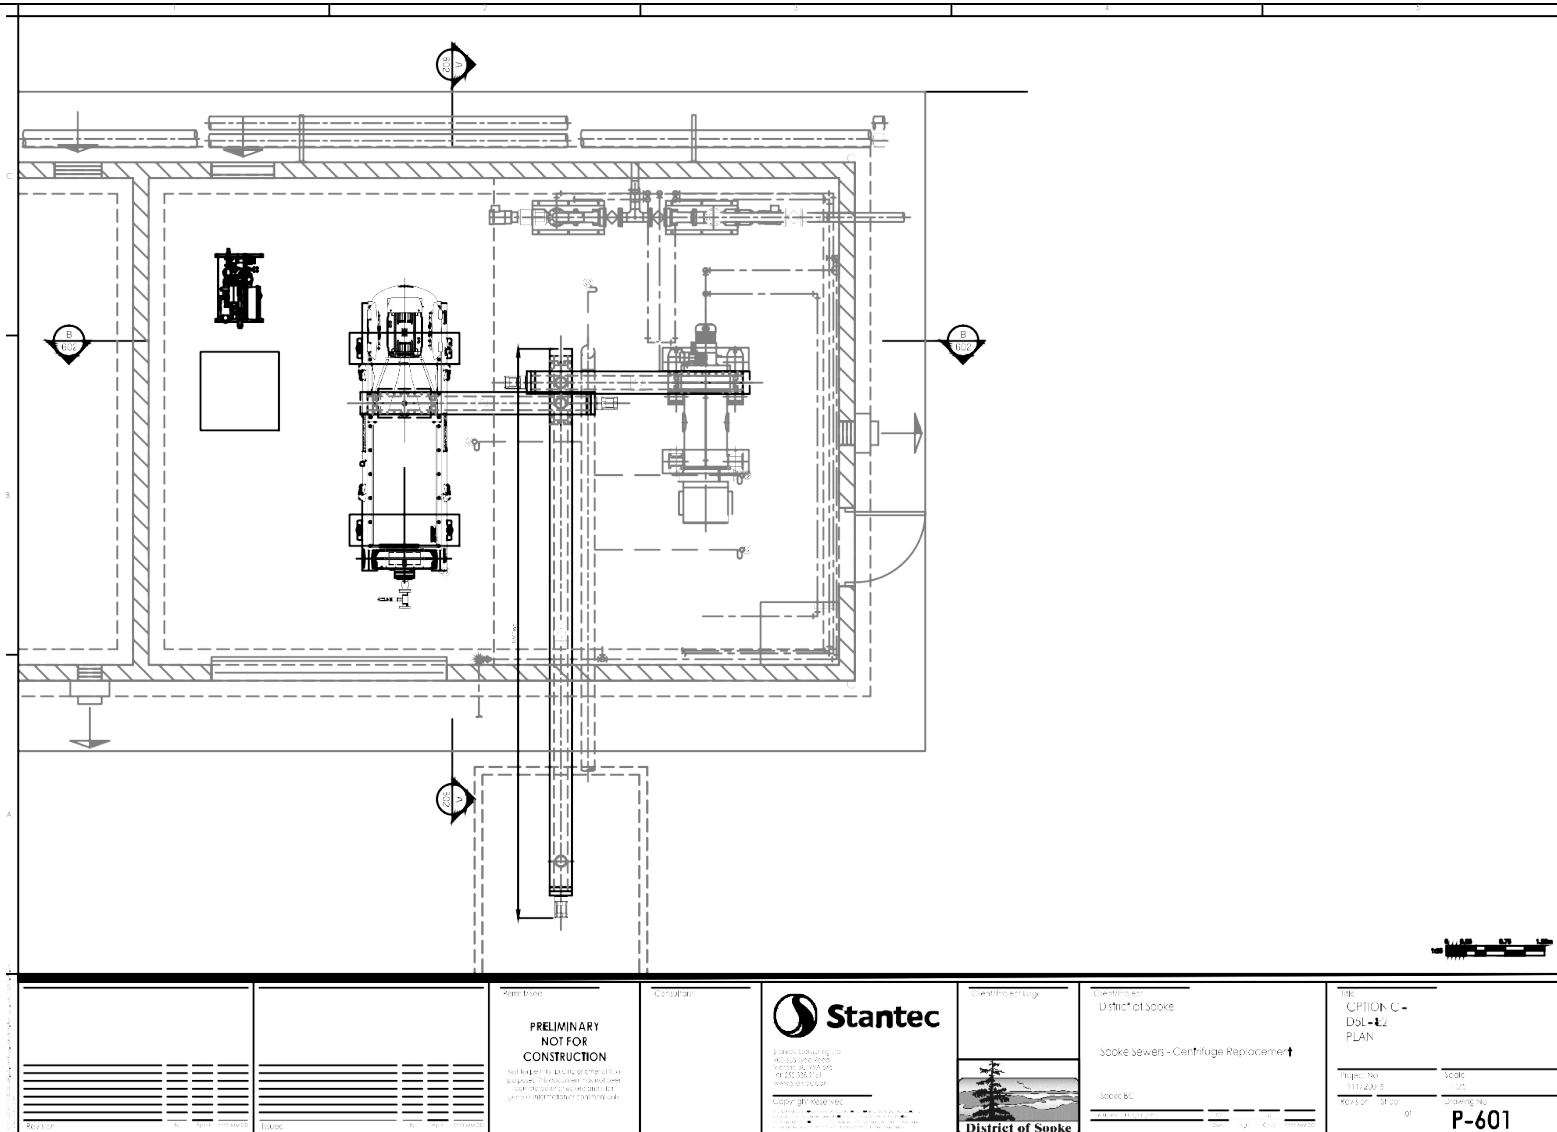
Dewatering Centrifuge Drawing - E2 plan
